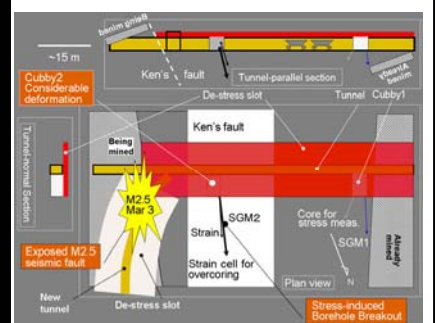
A plan schematics illustrating drill-holes, tunnels and geology.
